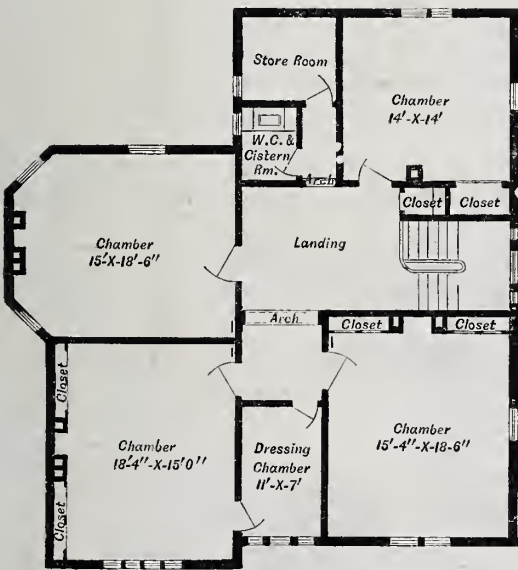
Attic Plan.—Scale, 1-16th Inch to the Foot.
